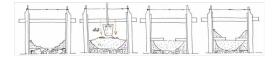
Resume of construction process: rammed earth wall with bricks (authors).
